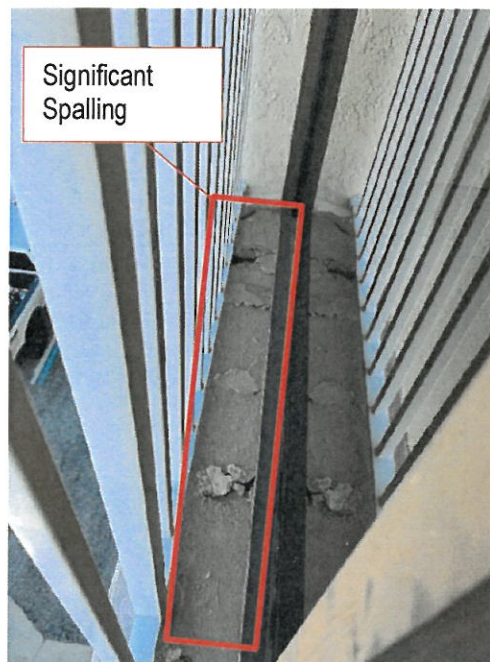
Significant Spall Occurring at Slab Edge, Unit 306
